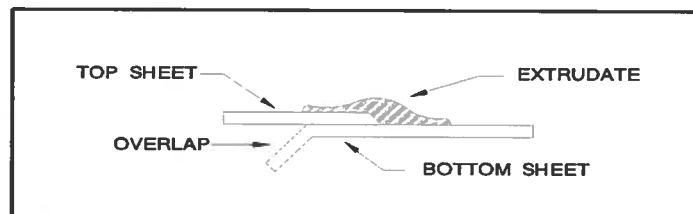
Fillet-Extruded Geomembrane Weld
